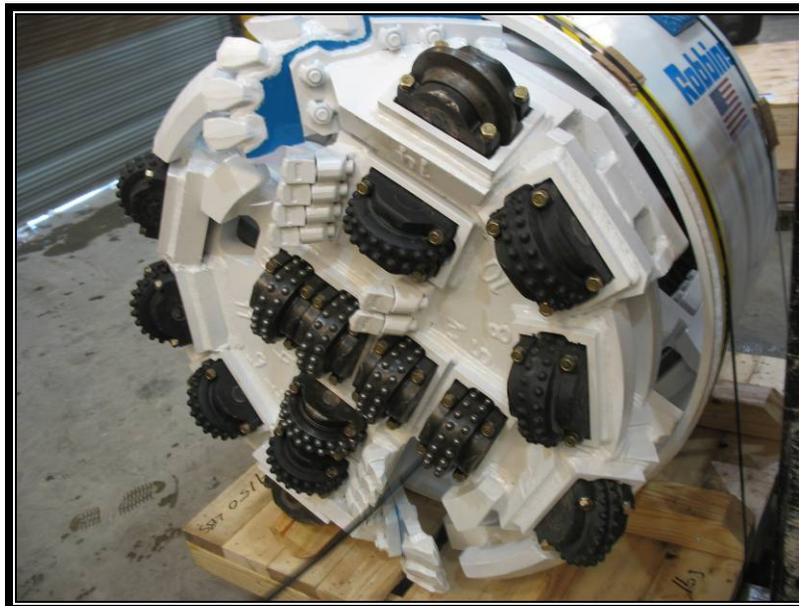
Mixed Ground Cutterhead with Two-Row Carbide Disc Cutters for Auger Boring
